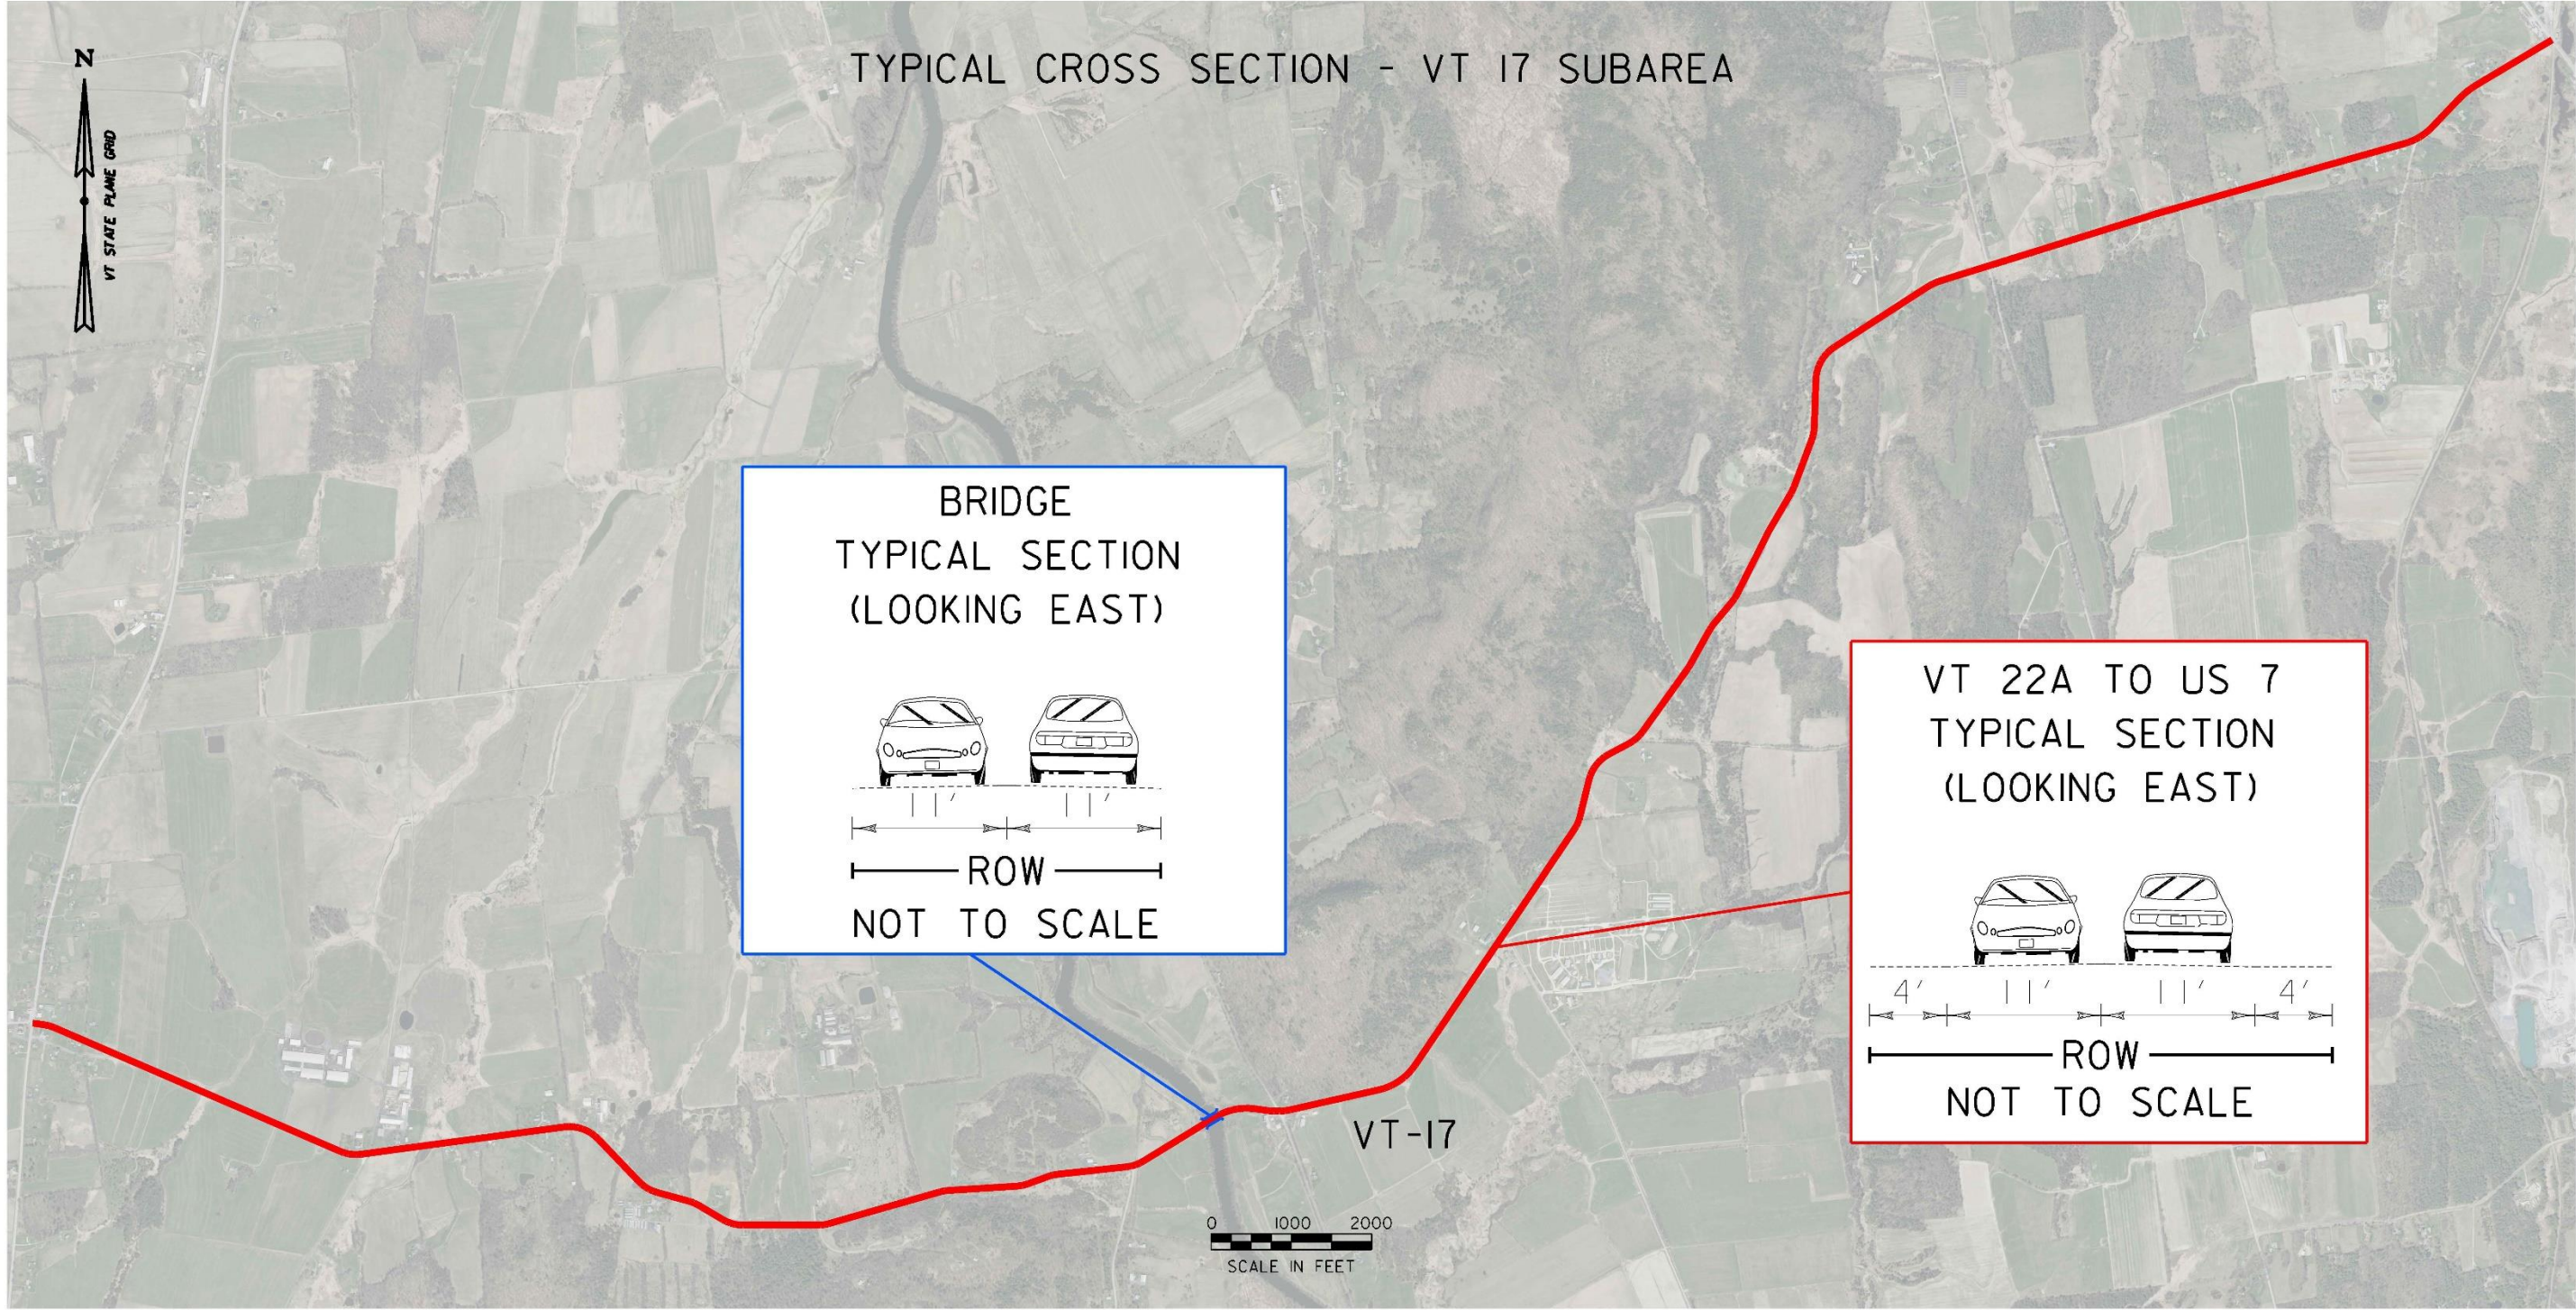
VT 17 Subarea and Roadway Cross Section
